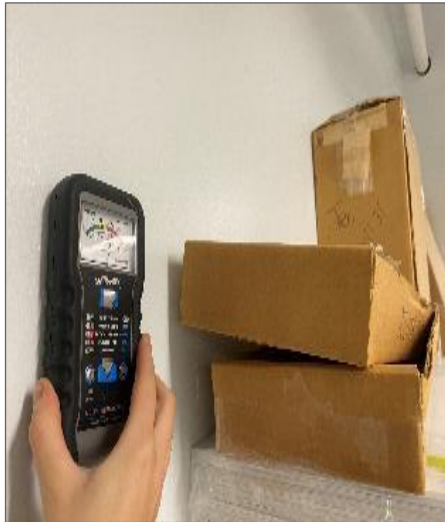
Elevated moisture detected on west wall adjacent to shelving unit.
